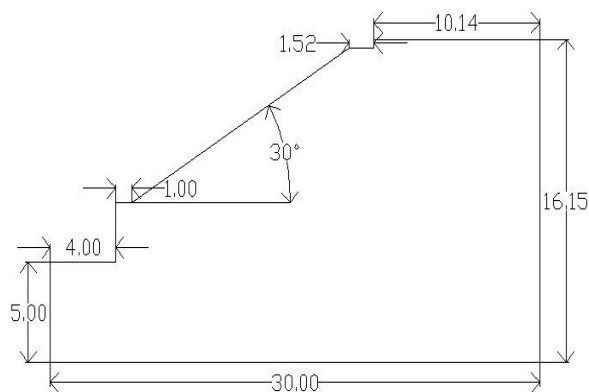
Geometric model of slope at Ponchoboti location of Rajshahi city protection embankment, Bangladesh
